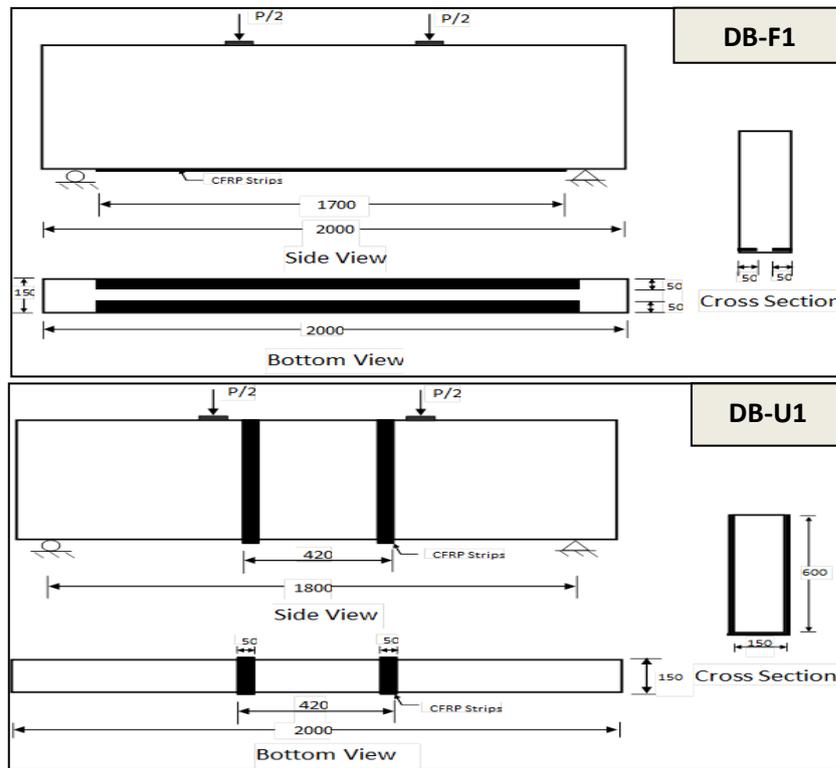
Details of Strengthened Beams With Lap Splices: DB-F1, DB-U1
